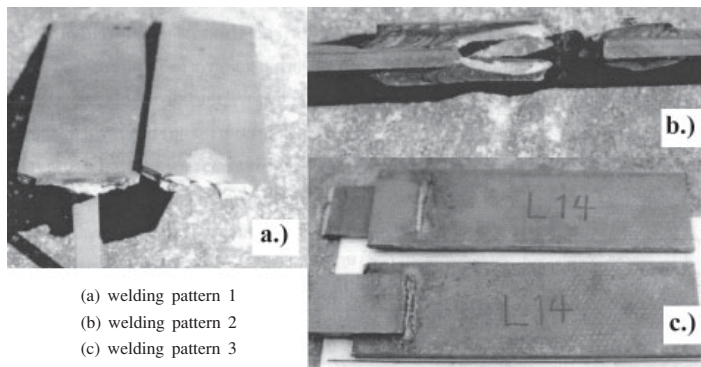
Typical mode of failure of welded connection specimens.
